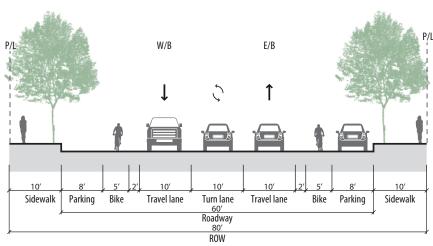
Typical Cross-Section for Foothill Boulevard, Grand Avenue to Glendora Avenue.
